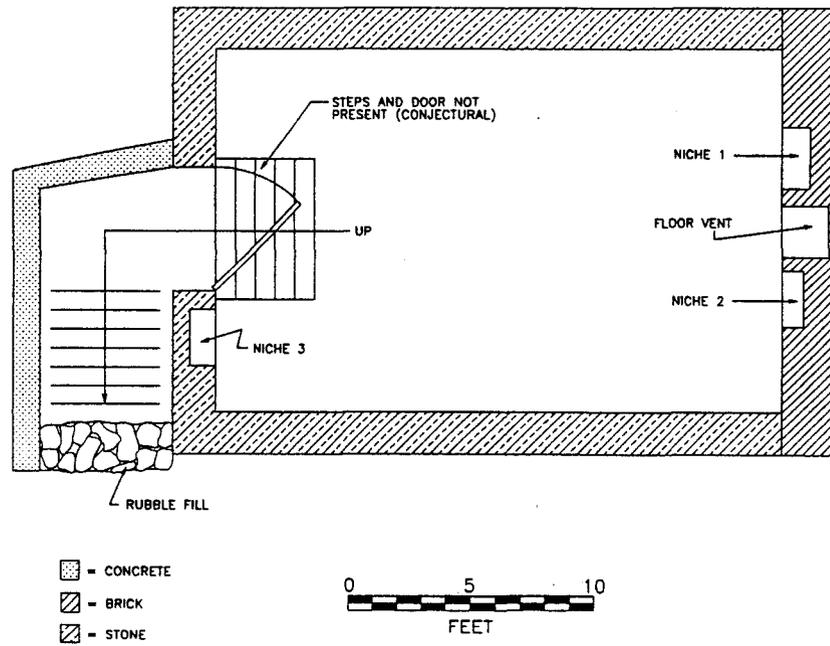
Cellar floor plan of the Wine Press Building at the Merkel Farmstead.
